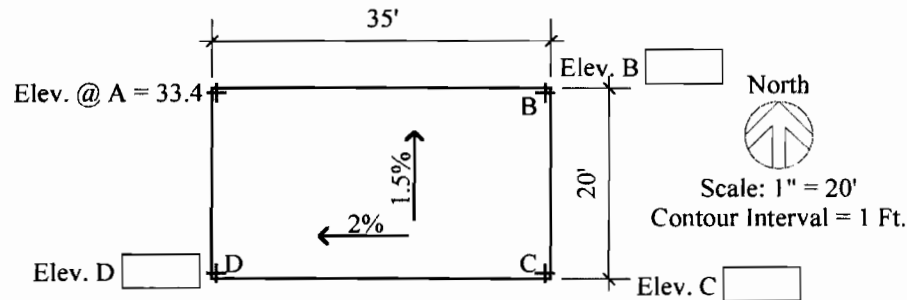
Finding Unknown Elevations at the Corners of a Plane Surface
